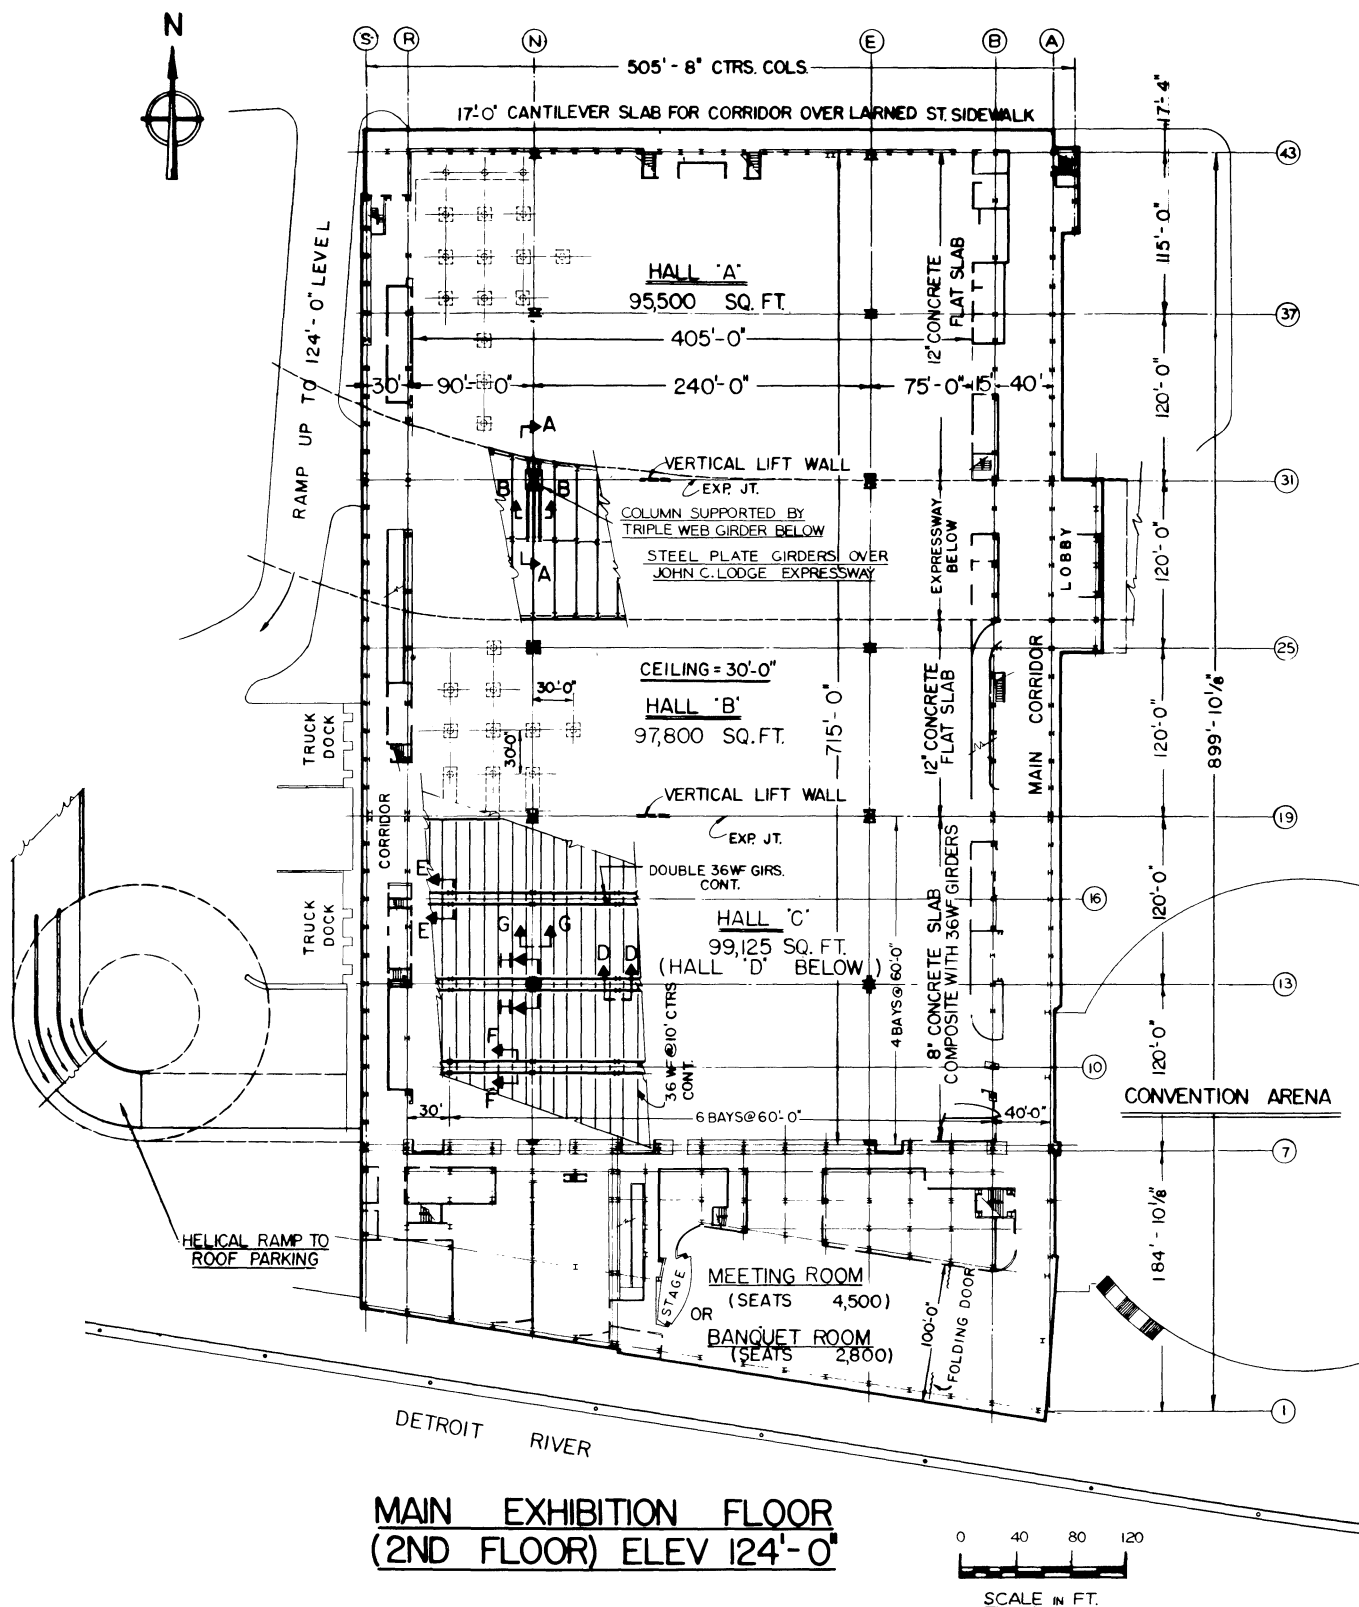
Cobo Hall, main exhibit floor framing plan.
